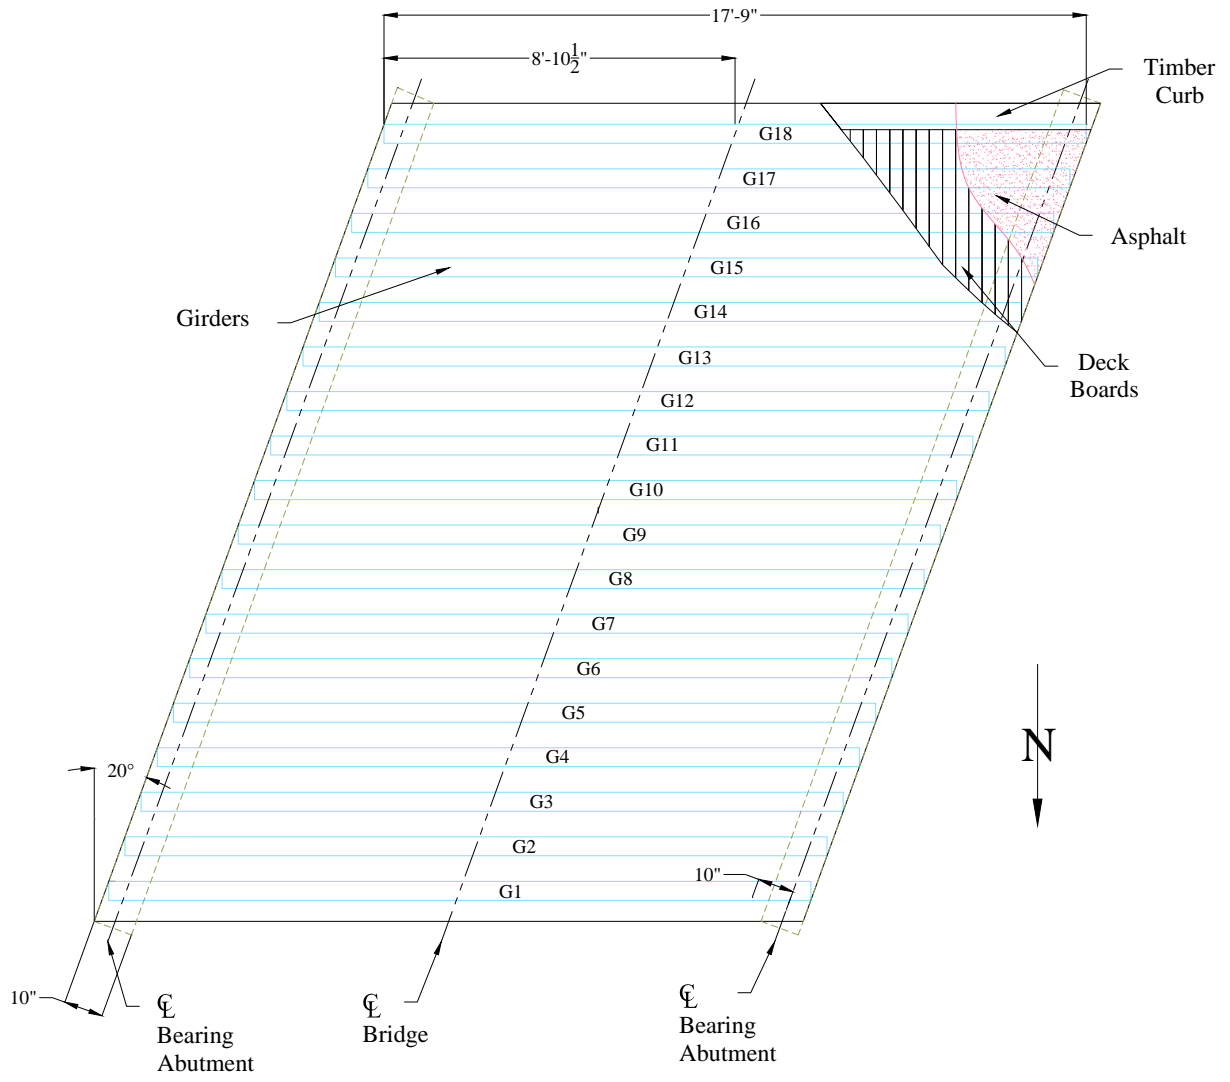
Plan and Profile Layout of Bald Creek Bridge
